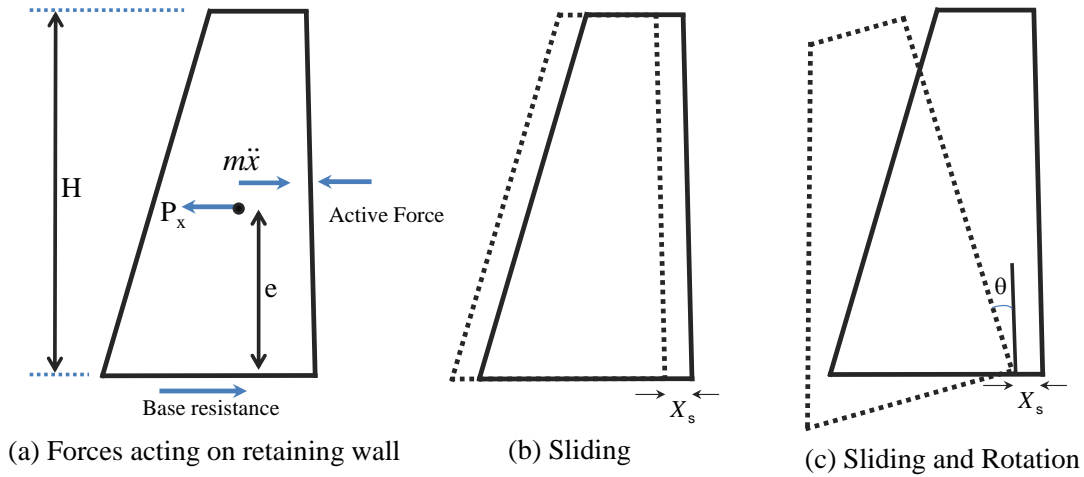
Forces acting on retaining wall, sliding and rotation of retaining wall.
